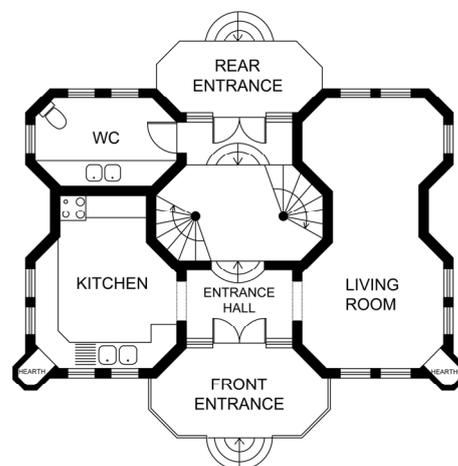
Plan of Sevgi Oncu House by Nail Cakirhan, as an example to the use of the second plan type (the central plan organization with a polygonal central *sofa* (*divanhane*)). Drawing by the author.
